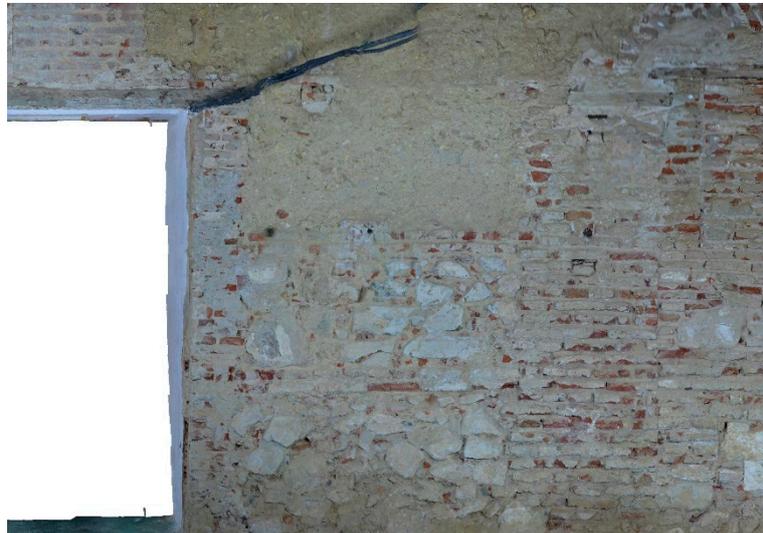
Detail of the masonry plinth and rammed earth wall of facing 3 of the original building
